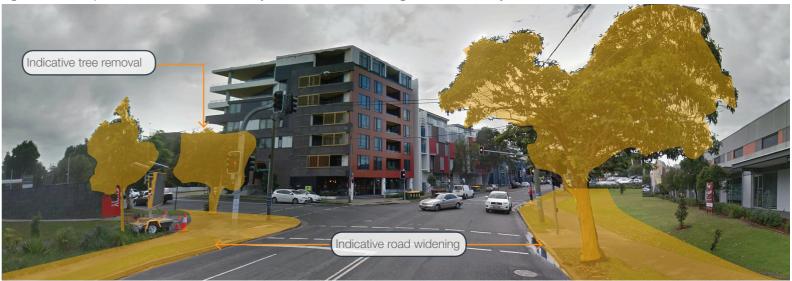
Viewpoint 02: McEvoy Street intersection, looking North into Fountain Street
